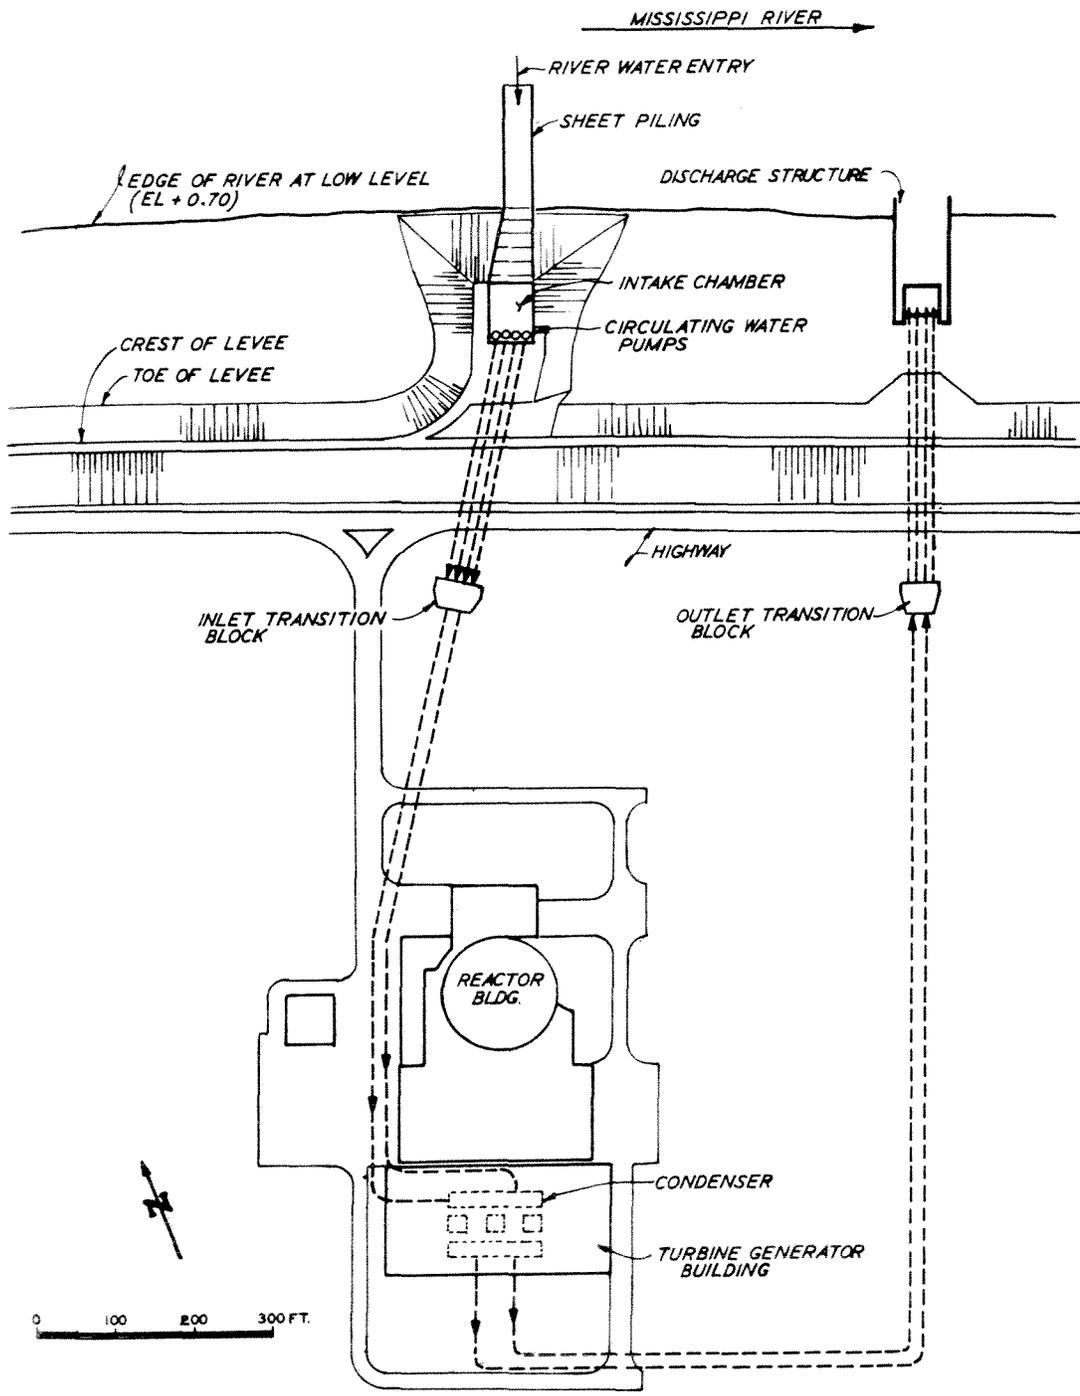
SITE PLAN SHOWING COOLING WATER INTAKE AND DISCHARGE SYSTEMS
